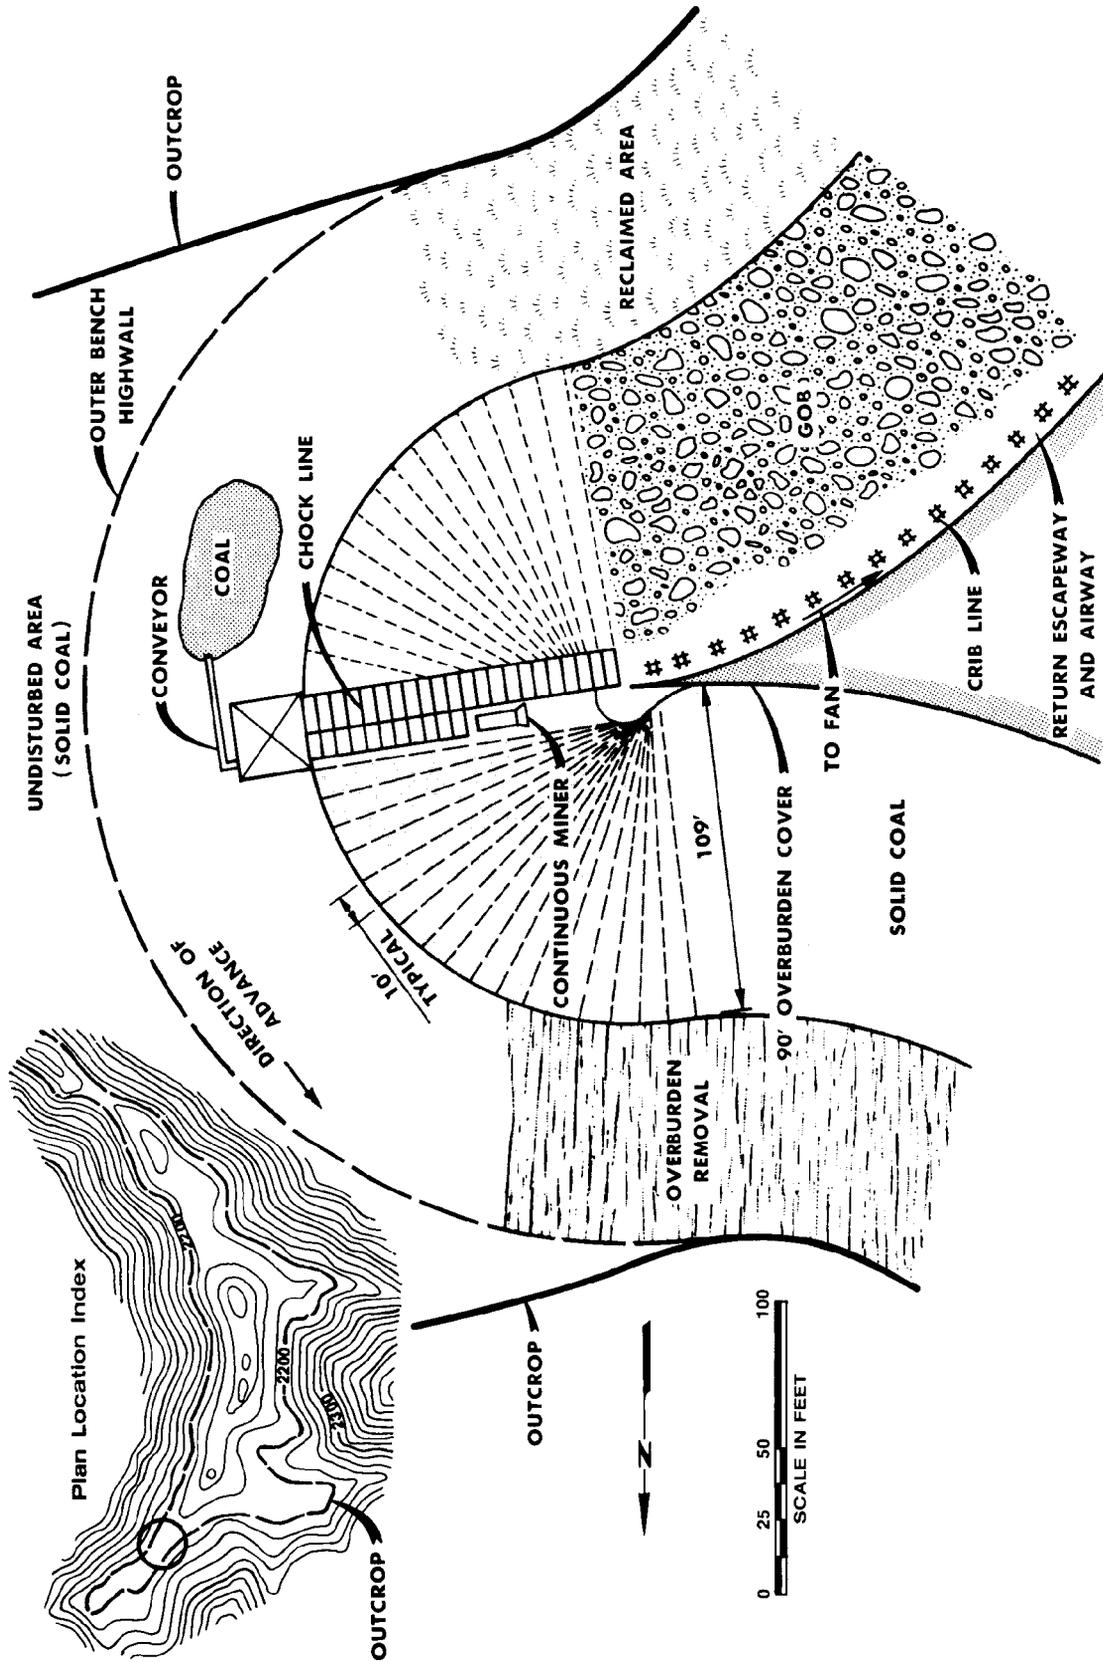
Plan view of outside curve at a typical W. Va. site.
